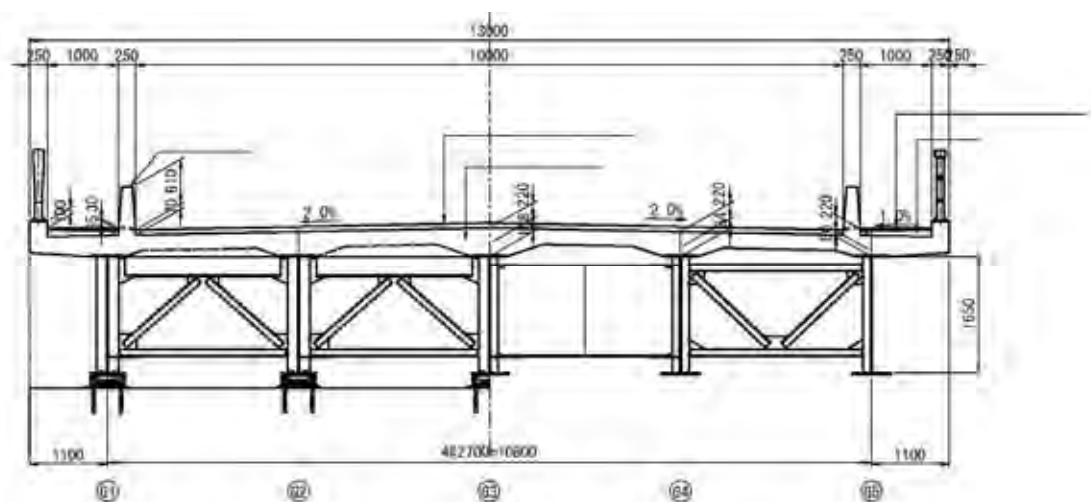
Sectional Profile of Steel Bridge (the Steel bridge No.2)
